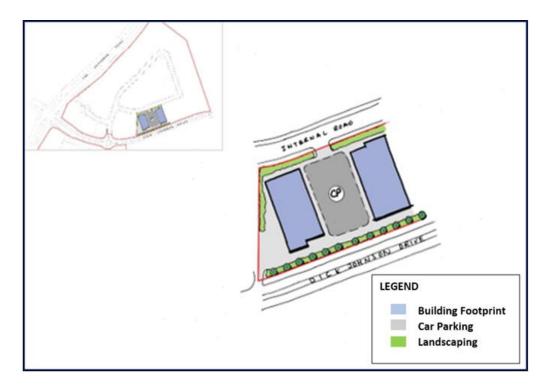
Concept Layout 1 for Dick Johnson Drive Interface
